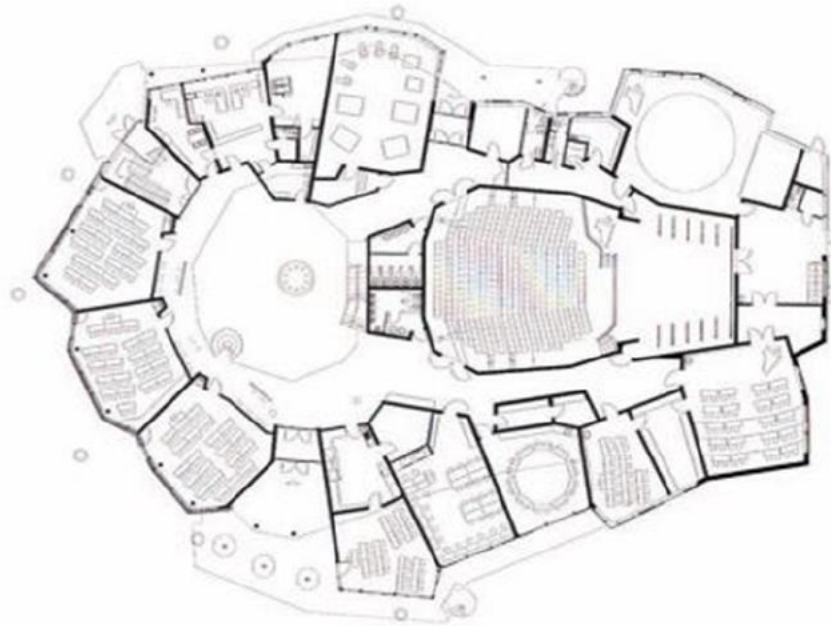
Freie Waldorfschule Ground Floor Plan, Source: (Blundell, Jones Peter. Peter Hübner: Bauen Als Ein Sozialer Prozess = Building as a Social Process. Stuttgart: Edition Axel Menges, 2007. 188)
